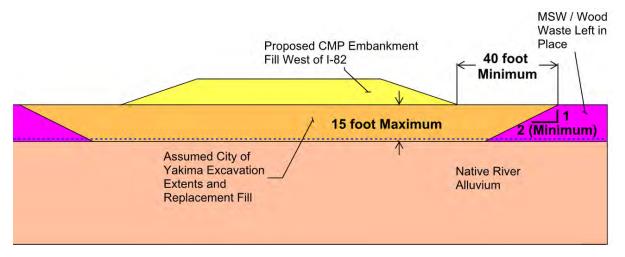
Assumed MSW and Wood Waste Geometric Parameters for CMP Embankment West of I-82
